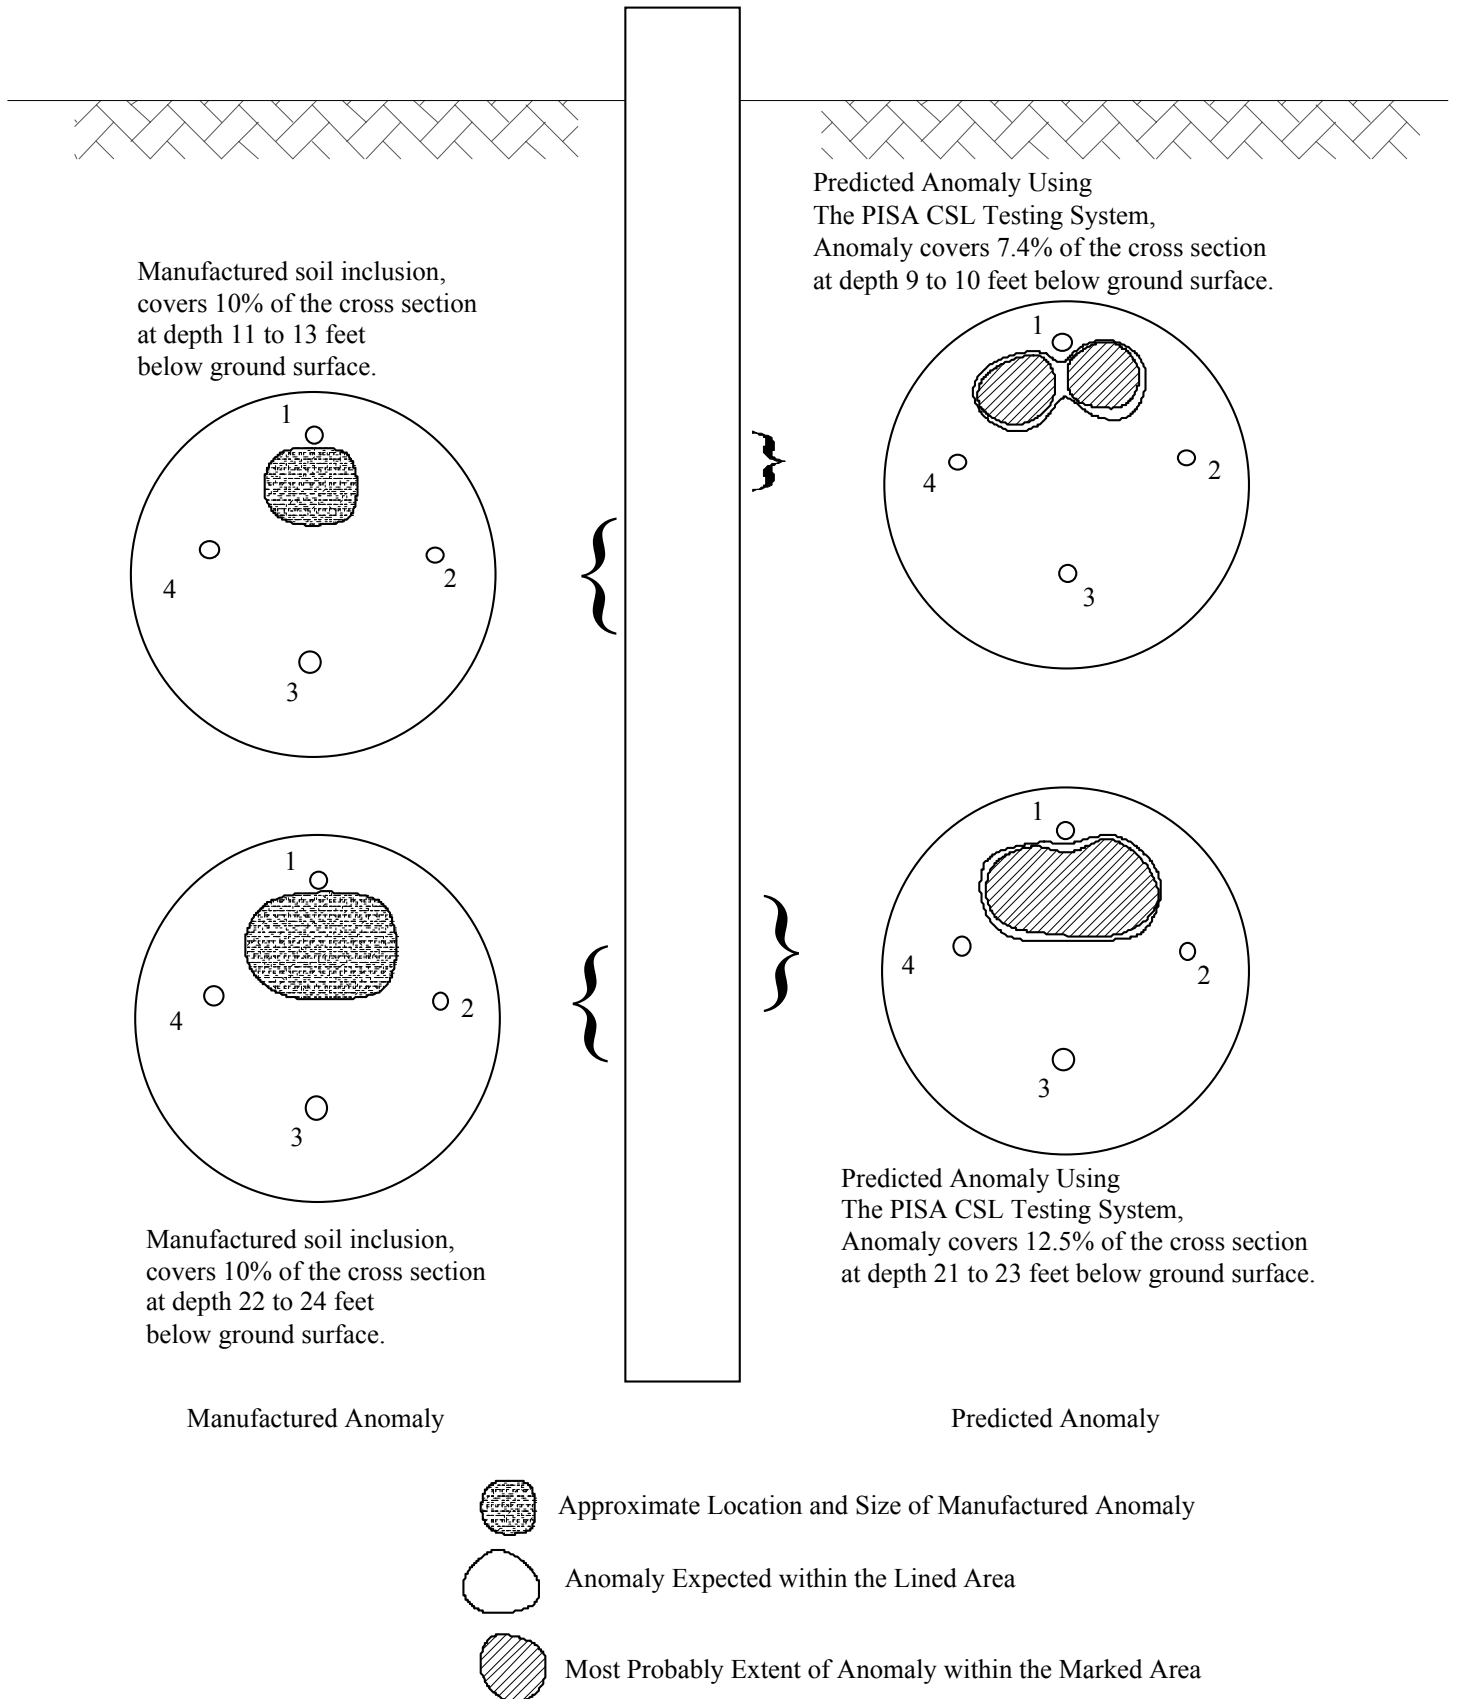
Presentation of manufactured defects with predicted results of PISA CSL testing system for Shaft 9 at the Auburn University test site.
